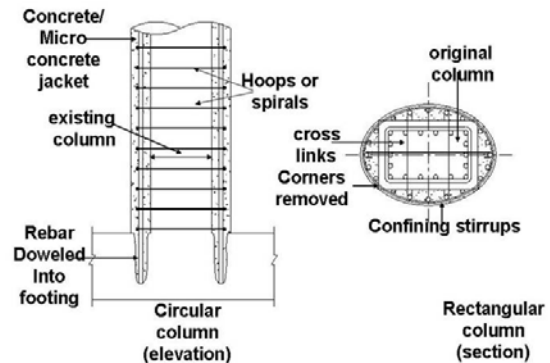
CONFINEMENT OF COLUMNS BY CONCRETE JACKETING
